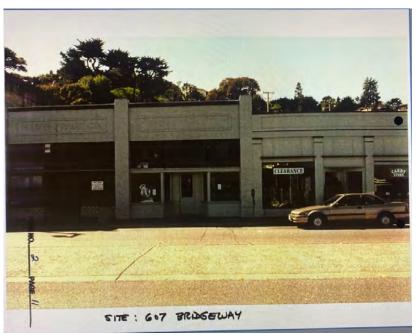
1993, site photos by Heine, designer for 607 Bridgeway "Cakery" store proposed project (City of Sausalito, digitized building records)
